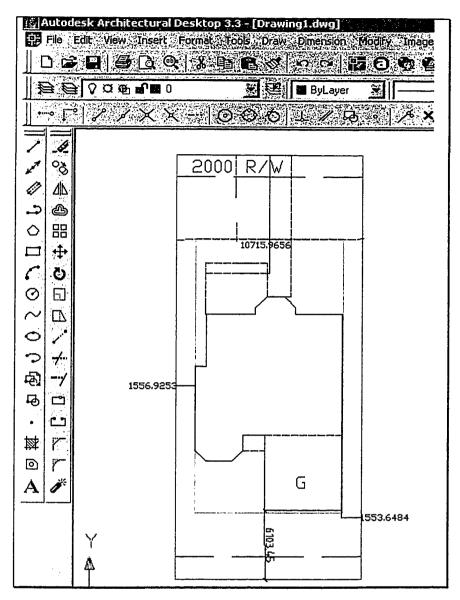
Site Plan showing Principle and Accessory Buildings
